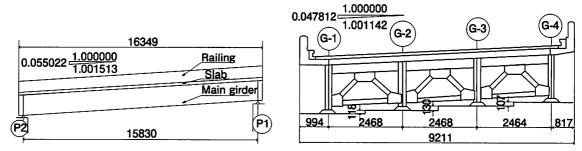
Elevation of Minato-machi Ramp Bridge Fig. 3 Cross section of Minato-machi Ramp Bridge
